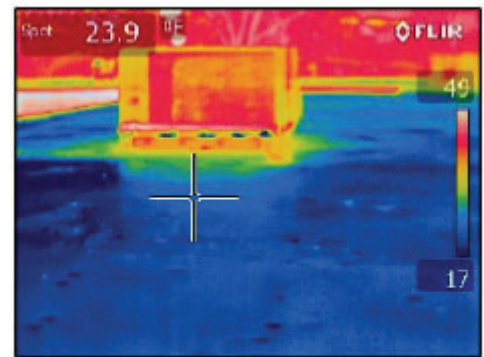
Scan of dry insulation on roof of Smith Building #2
